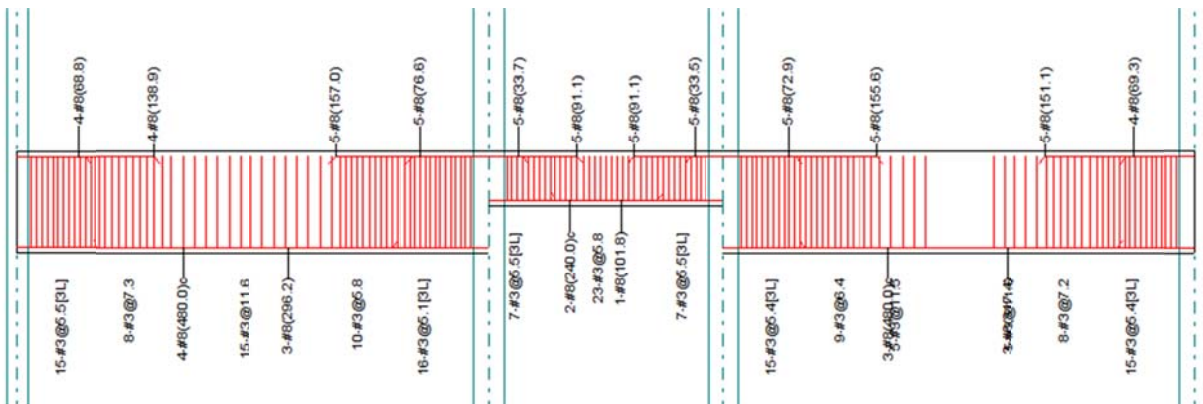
spBeam Column Line D Reinforcing Diagram (Lateral Loads)
